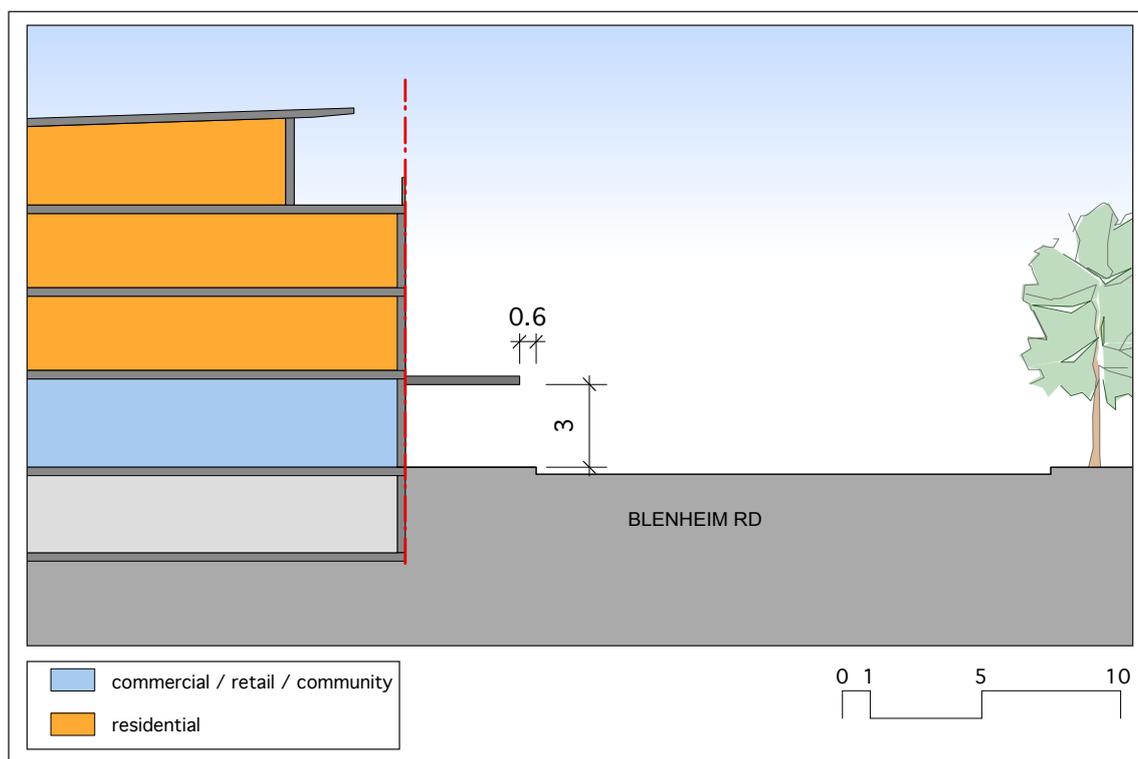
Blenheim Road Small Centre Awning Control Cross Section
